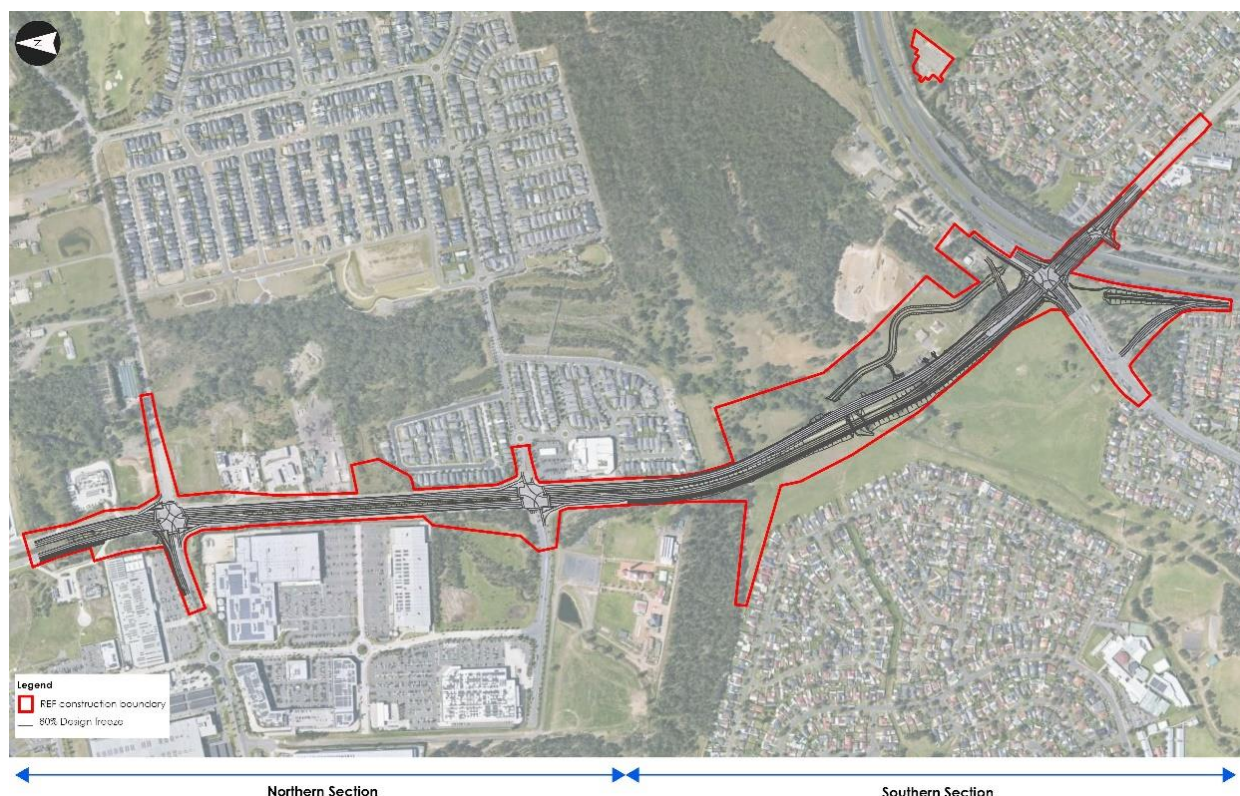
Richmond Road construction staging Stage 1 (northern section) and Stage 2 (southern section) (Source: Stantec, 2024)
